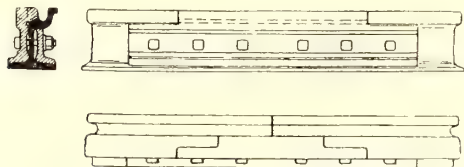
SHOWING ORIGINAL CONSTRUCTION OF RAIL-JOINT
